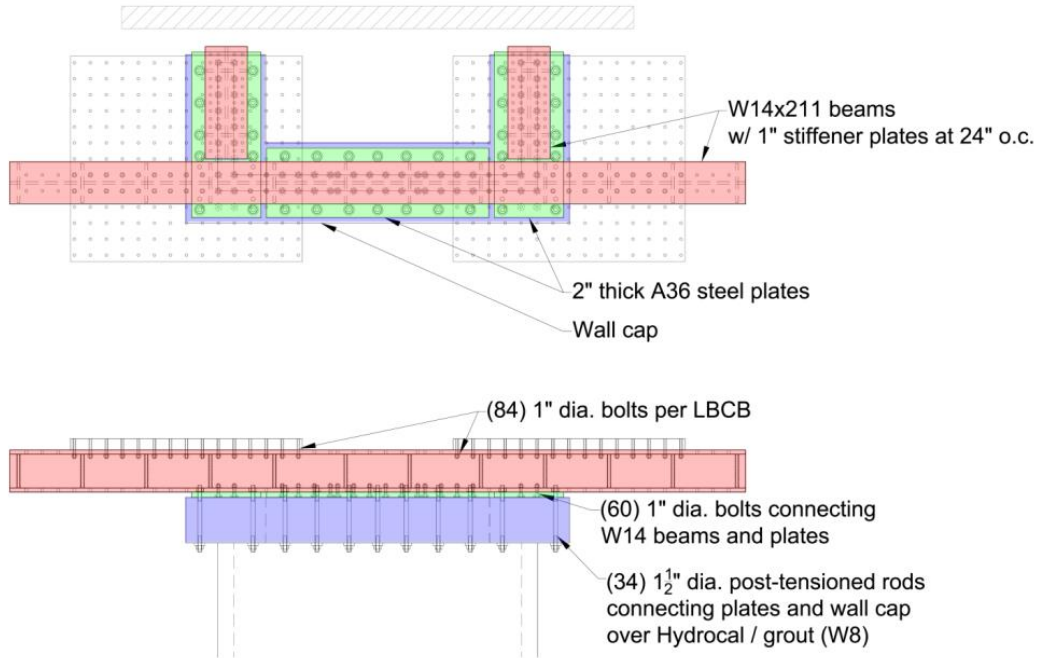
Cross-sectional drawing (Section B) of the experimental test setup
